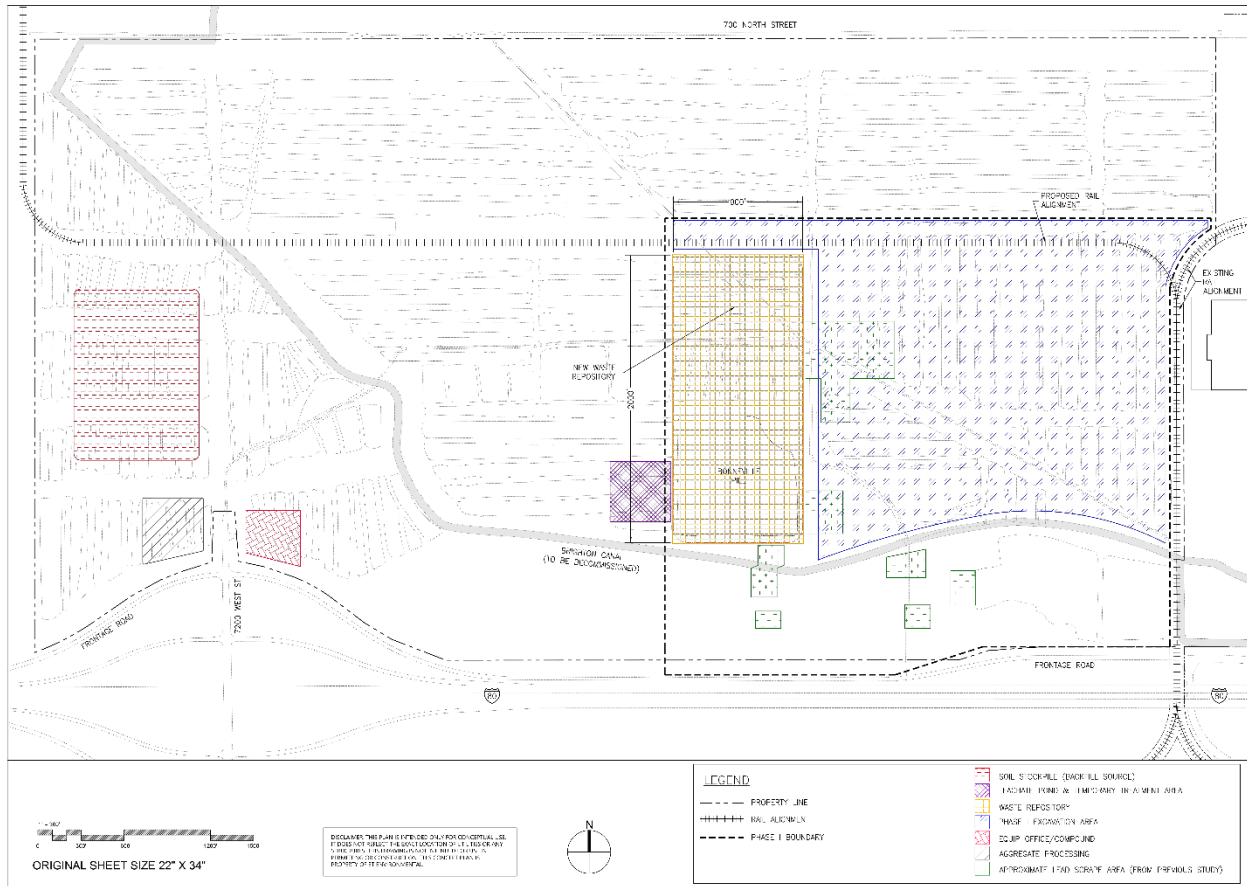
Site Logistics Plan (See Also Appendix A-11)
